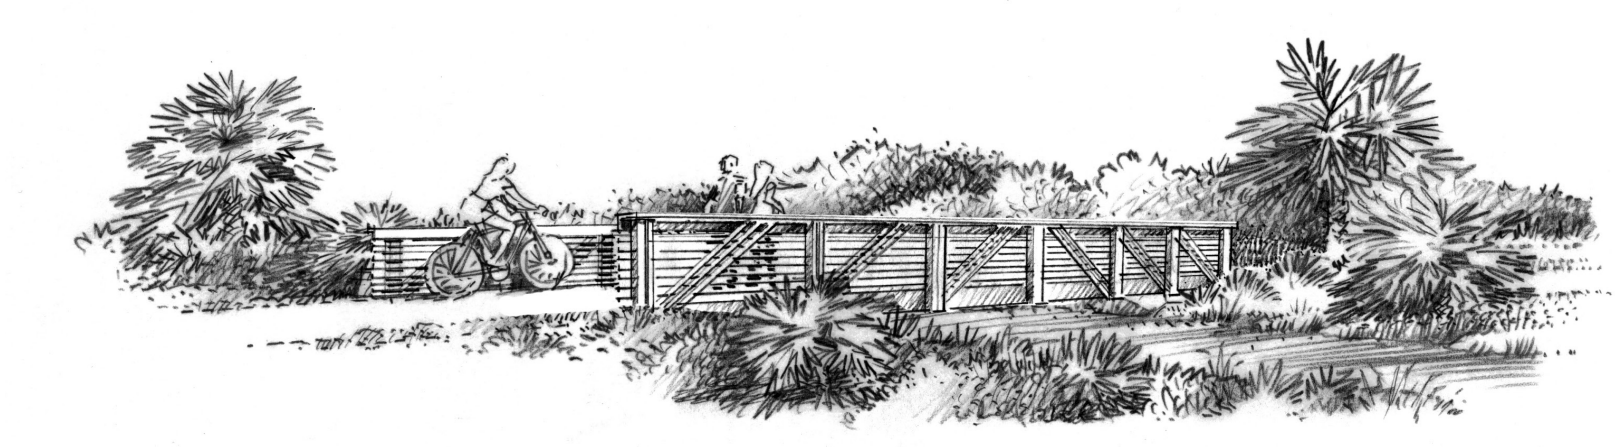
PEDESTRIAN BRIDGE OVER DRAINAGE AREA
